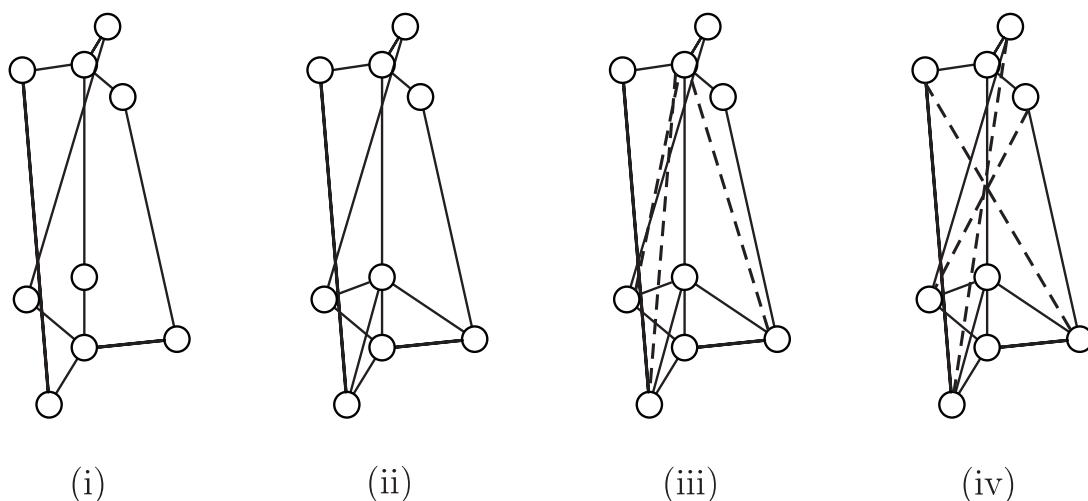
Bracing options for the IBGS: (i) no bracing, (ii) inclined bracing, (iii) additional bracing option A and (iv) additional bracing option B.
